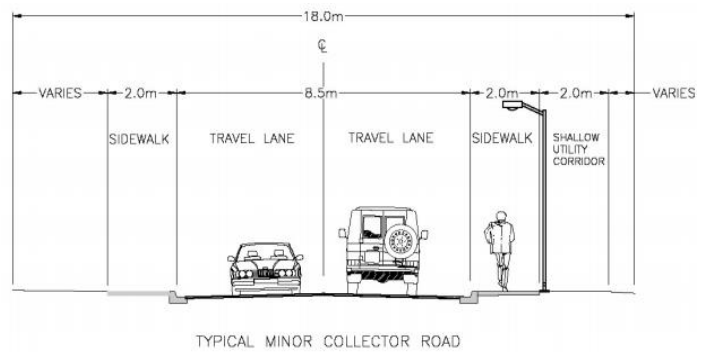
Collector Road Cross-Section (TMP Section 6.1.3)
